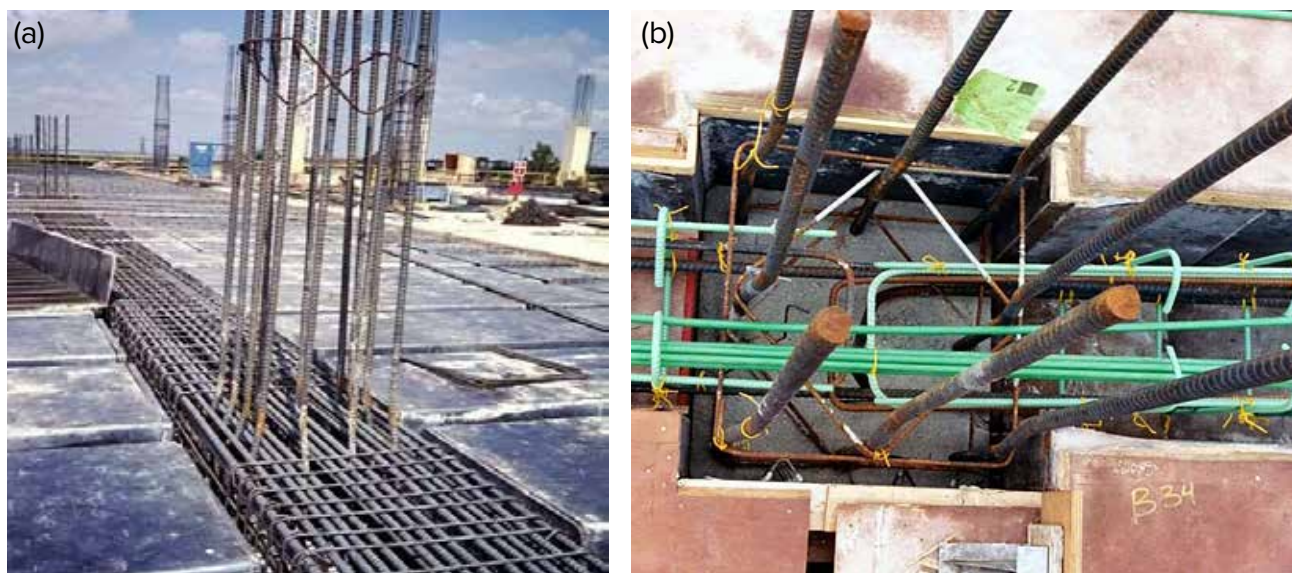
Formwork and reinforcement at column-beam intersections: (a) a desirable beam width allows crews to route beam reinforcement around column bars; and (b) an undesirable beam width adds to formwork complexity and can result in interference between beam and column bars. (Images courtesy of CRSI.)
